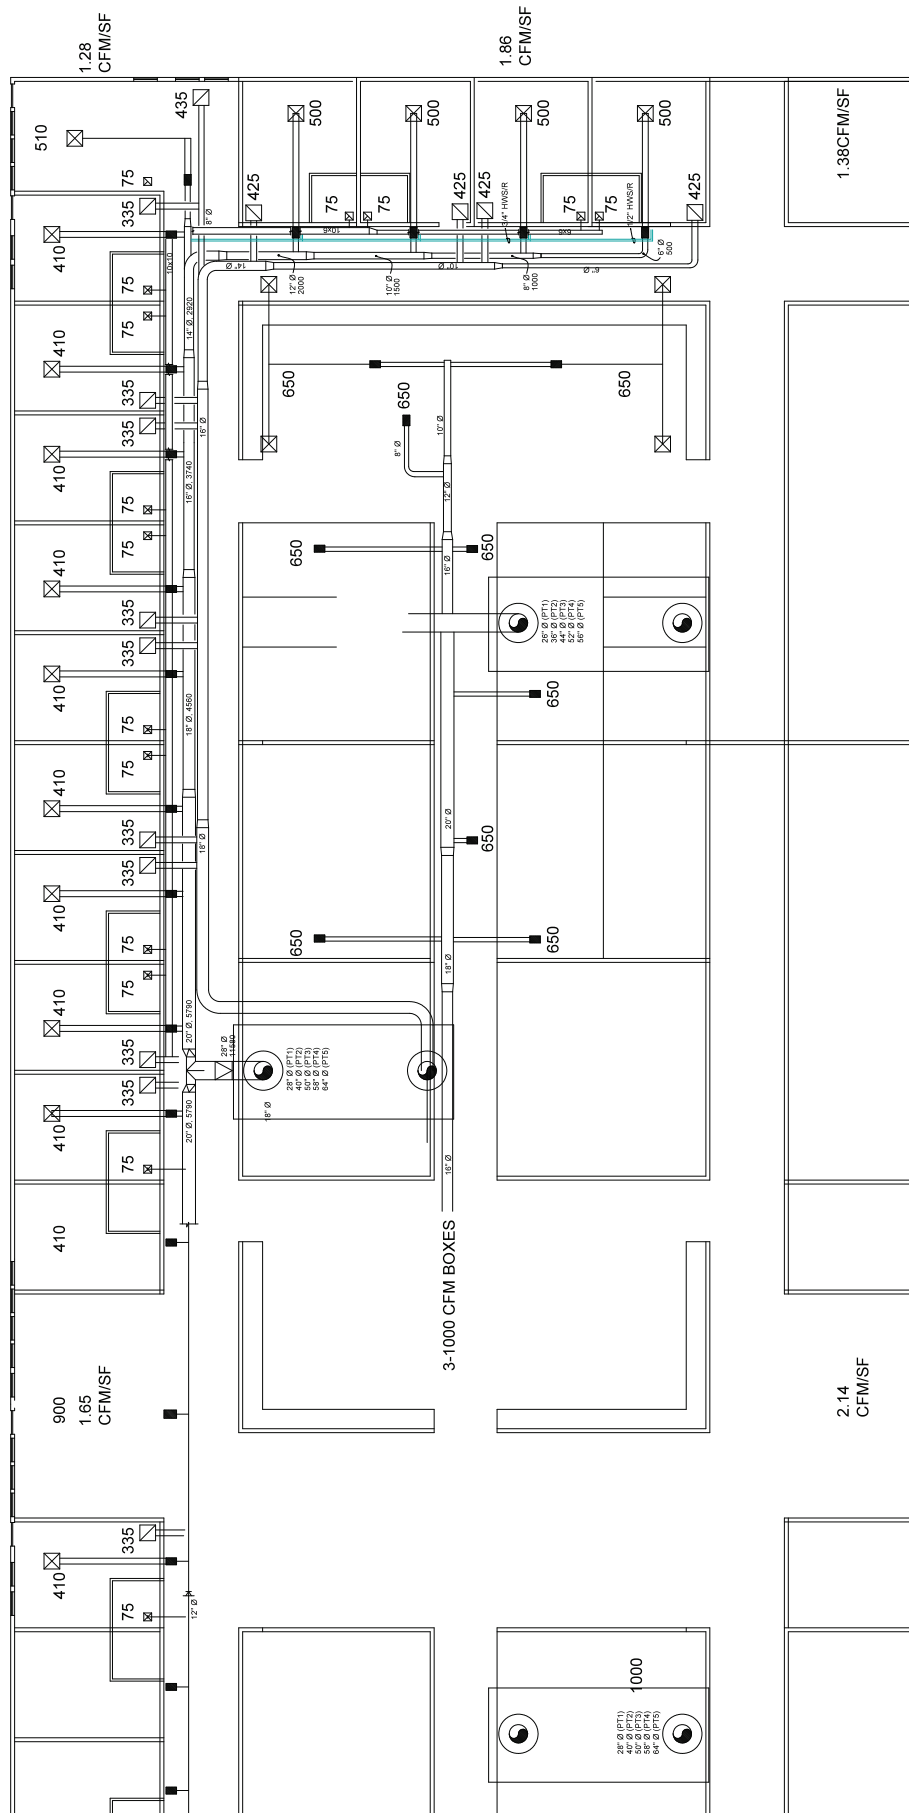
Partial Plan – Typical Patient Floor Duct Layout – Option A1 (Not to Scale)
